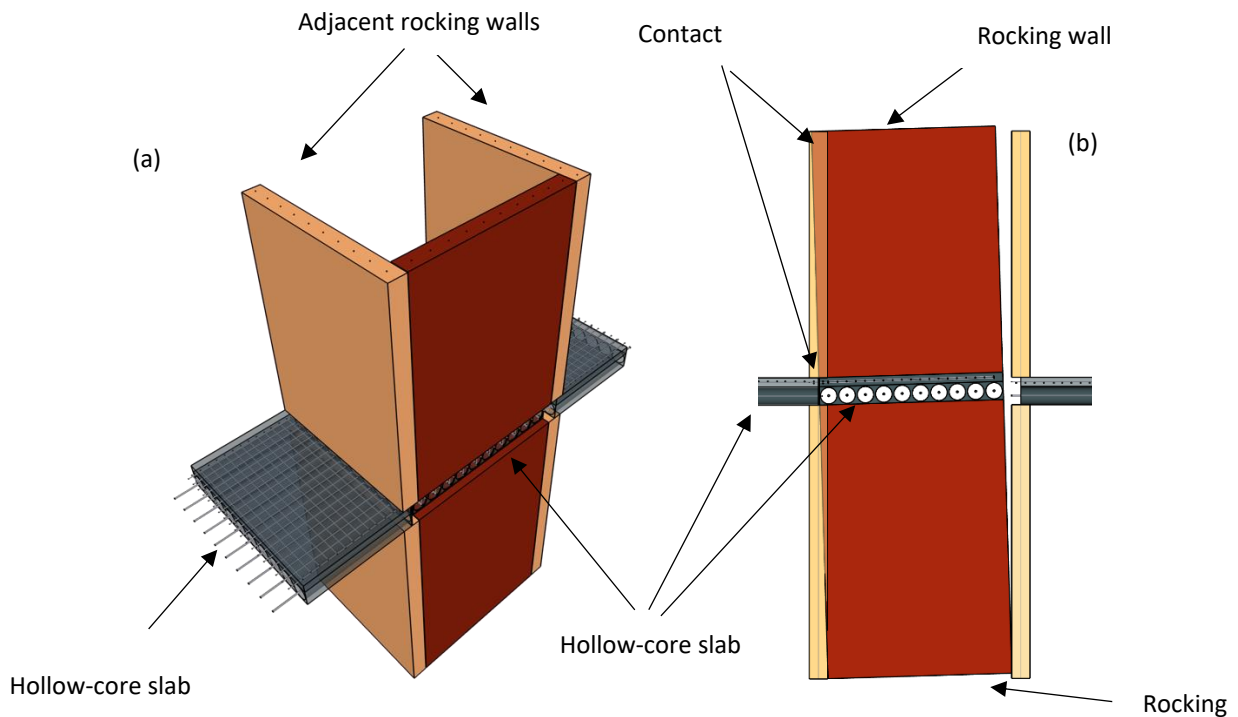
(a) Isometric view for a rocking wall with adjacent walls and hollow-core slabs. (b) Elevation view with the pounding/contact due to the rocking of the wall.
